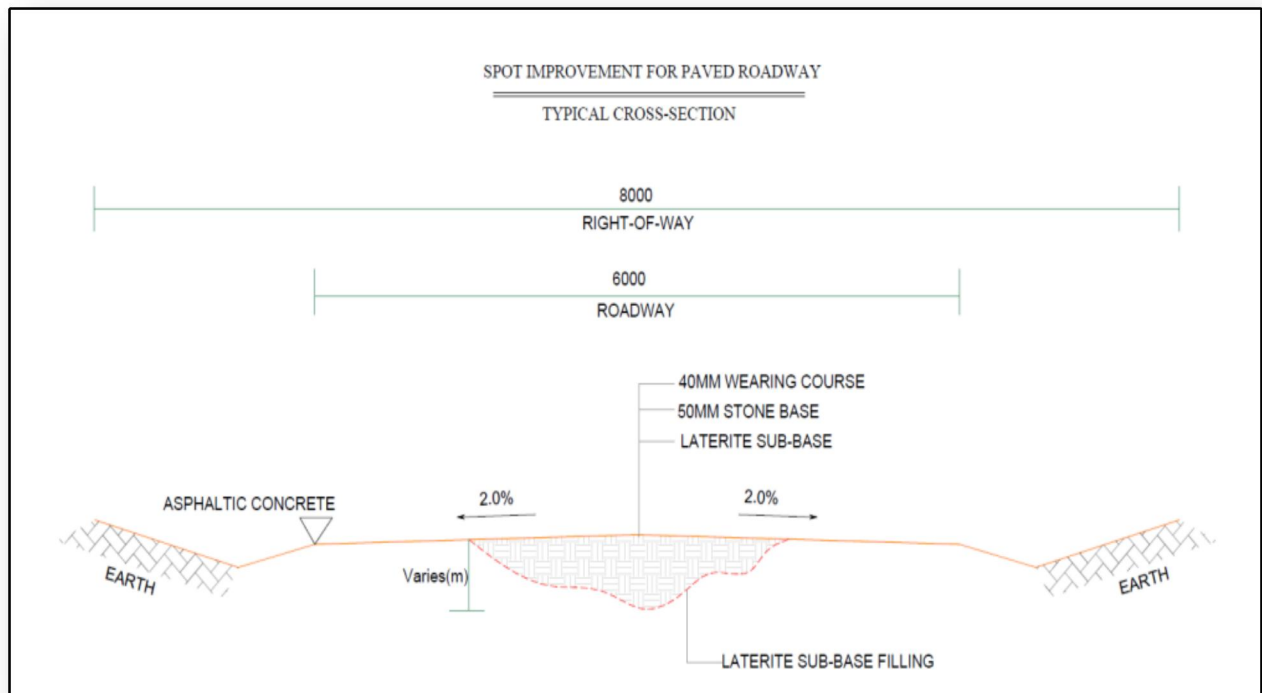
Restoring/Replacing of Base, Sub-base and Subgrade for Paved Roadway
